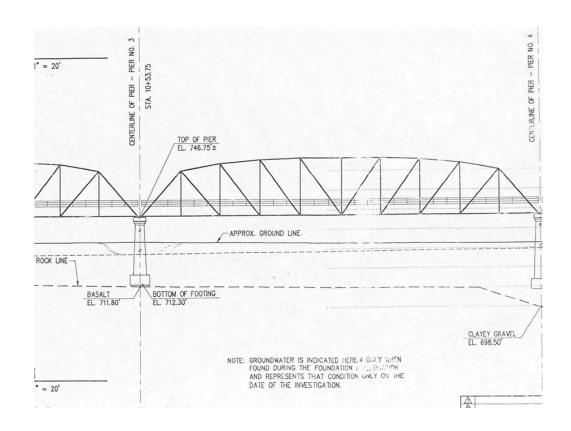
Elevation of typical span of the US-80 bridge over the Gila River, from construction documents
